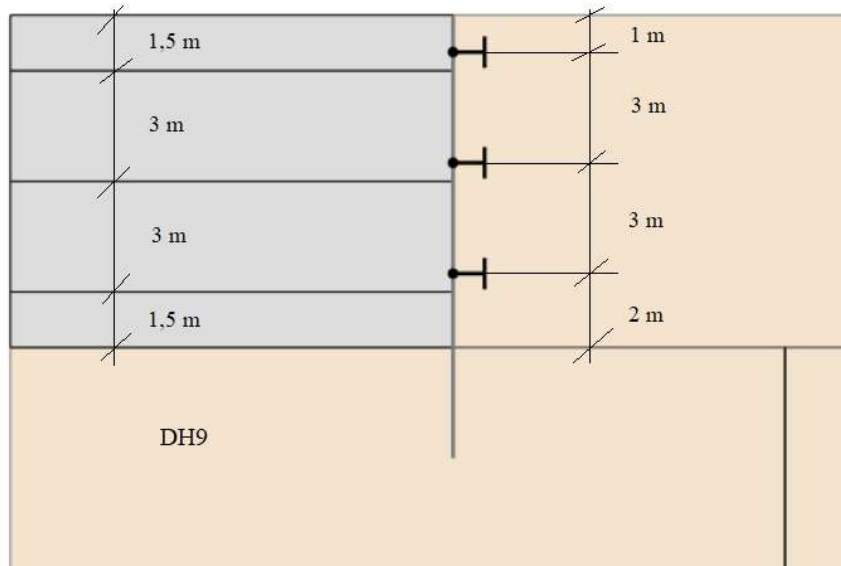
Geometry of constraint placement and excavation phases for concrete diaphragm and excavation depth of 9 m.
